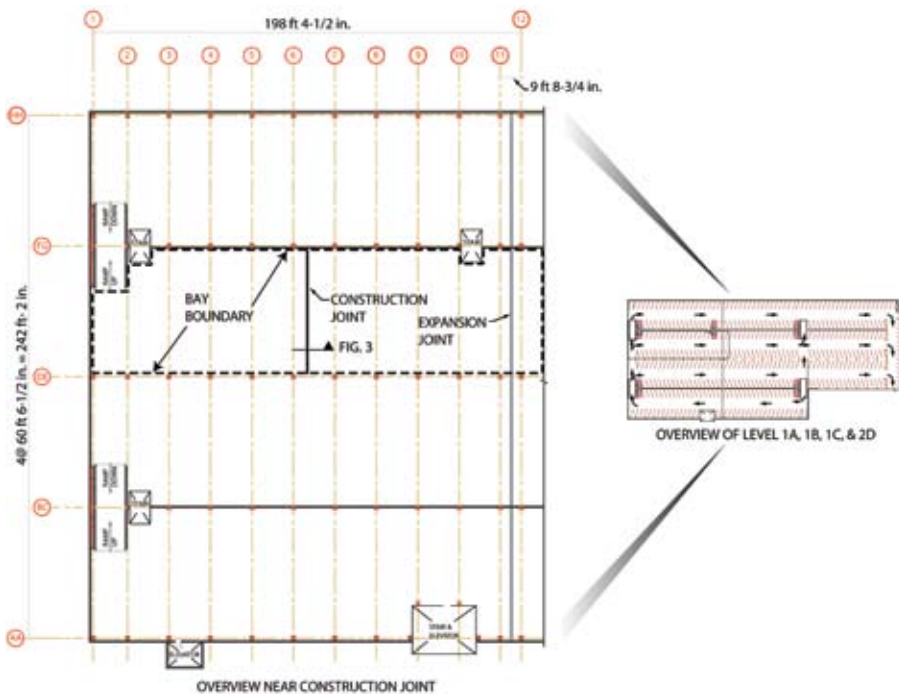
Plan of the parking garage showing the area of the post-tensioned floor slab that was investigated with various NDT techniques
